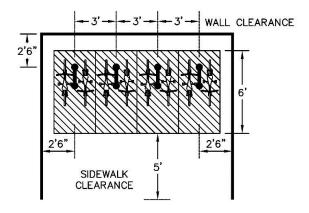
Bike Rack Spacing (Near Vertical Obstructions)
